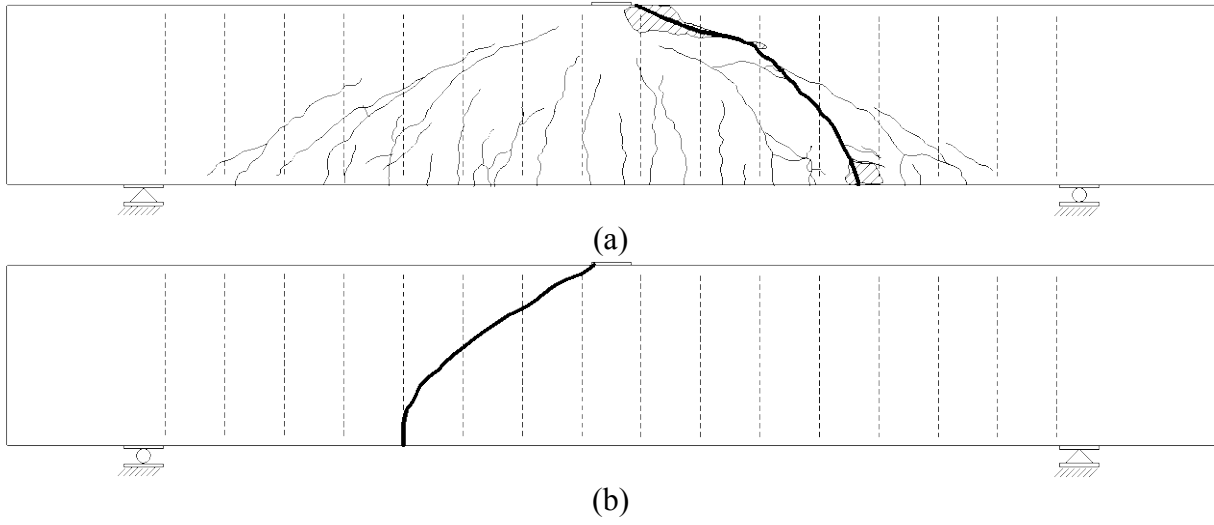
Observed damage in specimen P1S4, (a) front side, (b) back side
